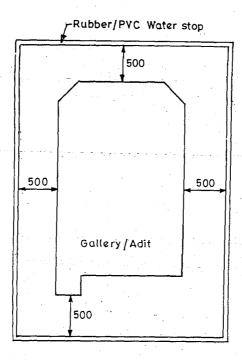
Rubber/PVC waterstop around Dam Gallery/Adit at contraction joints.
